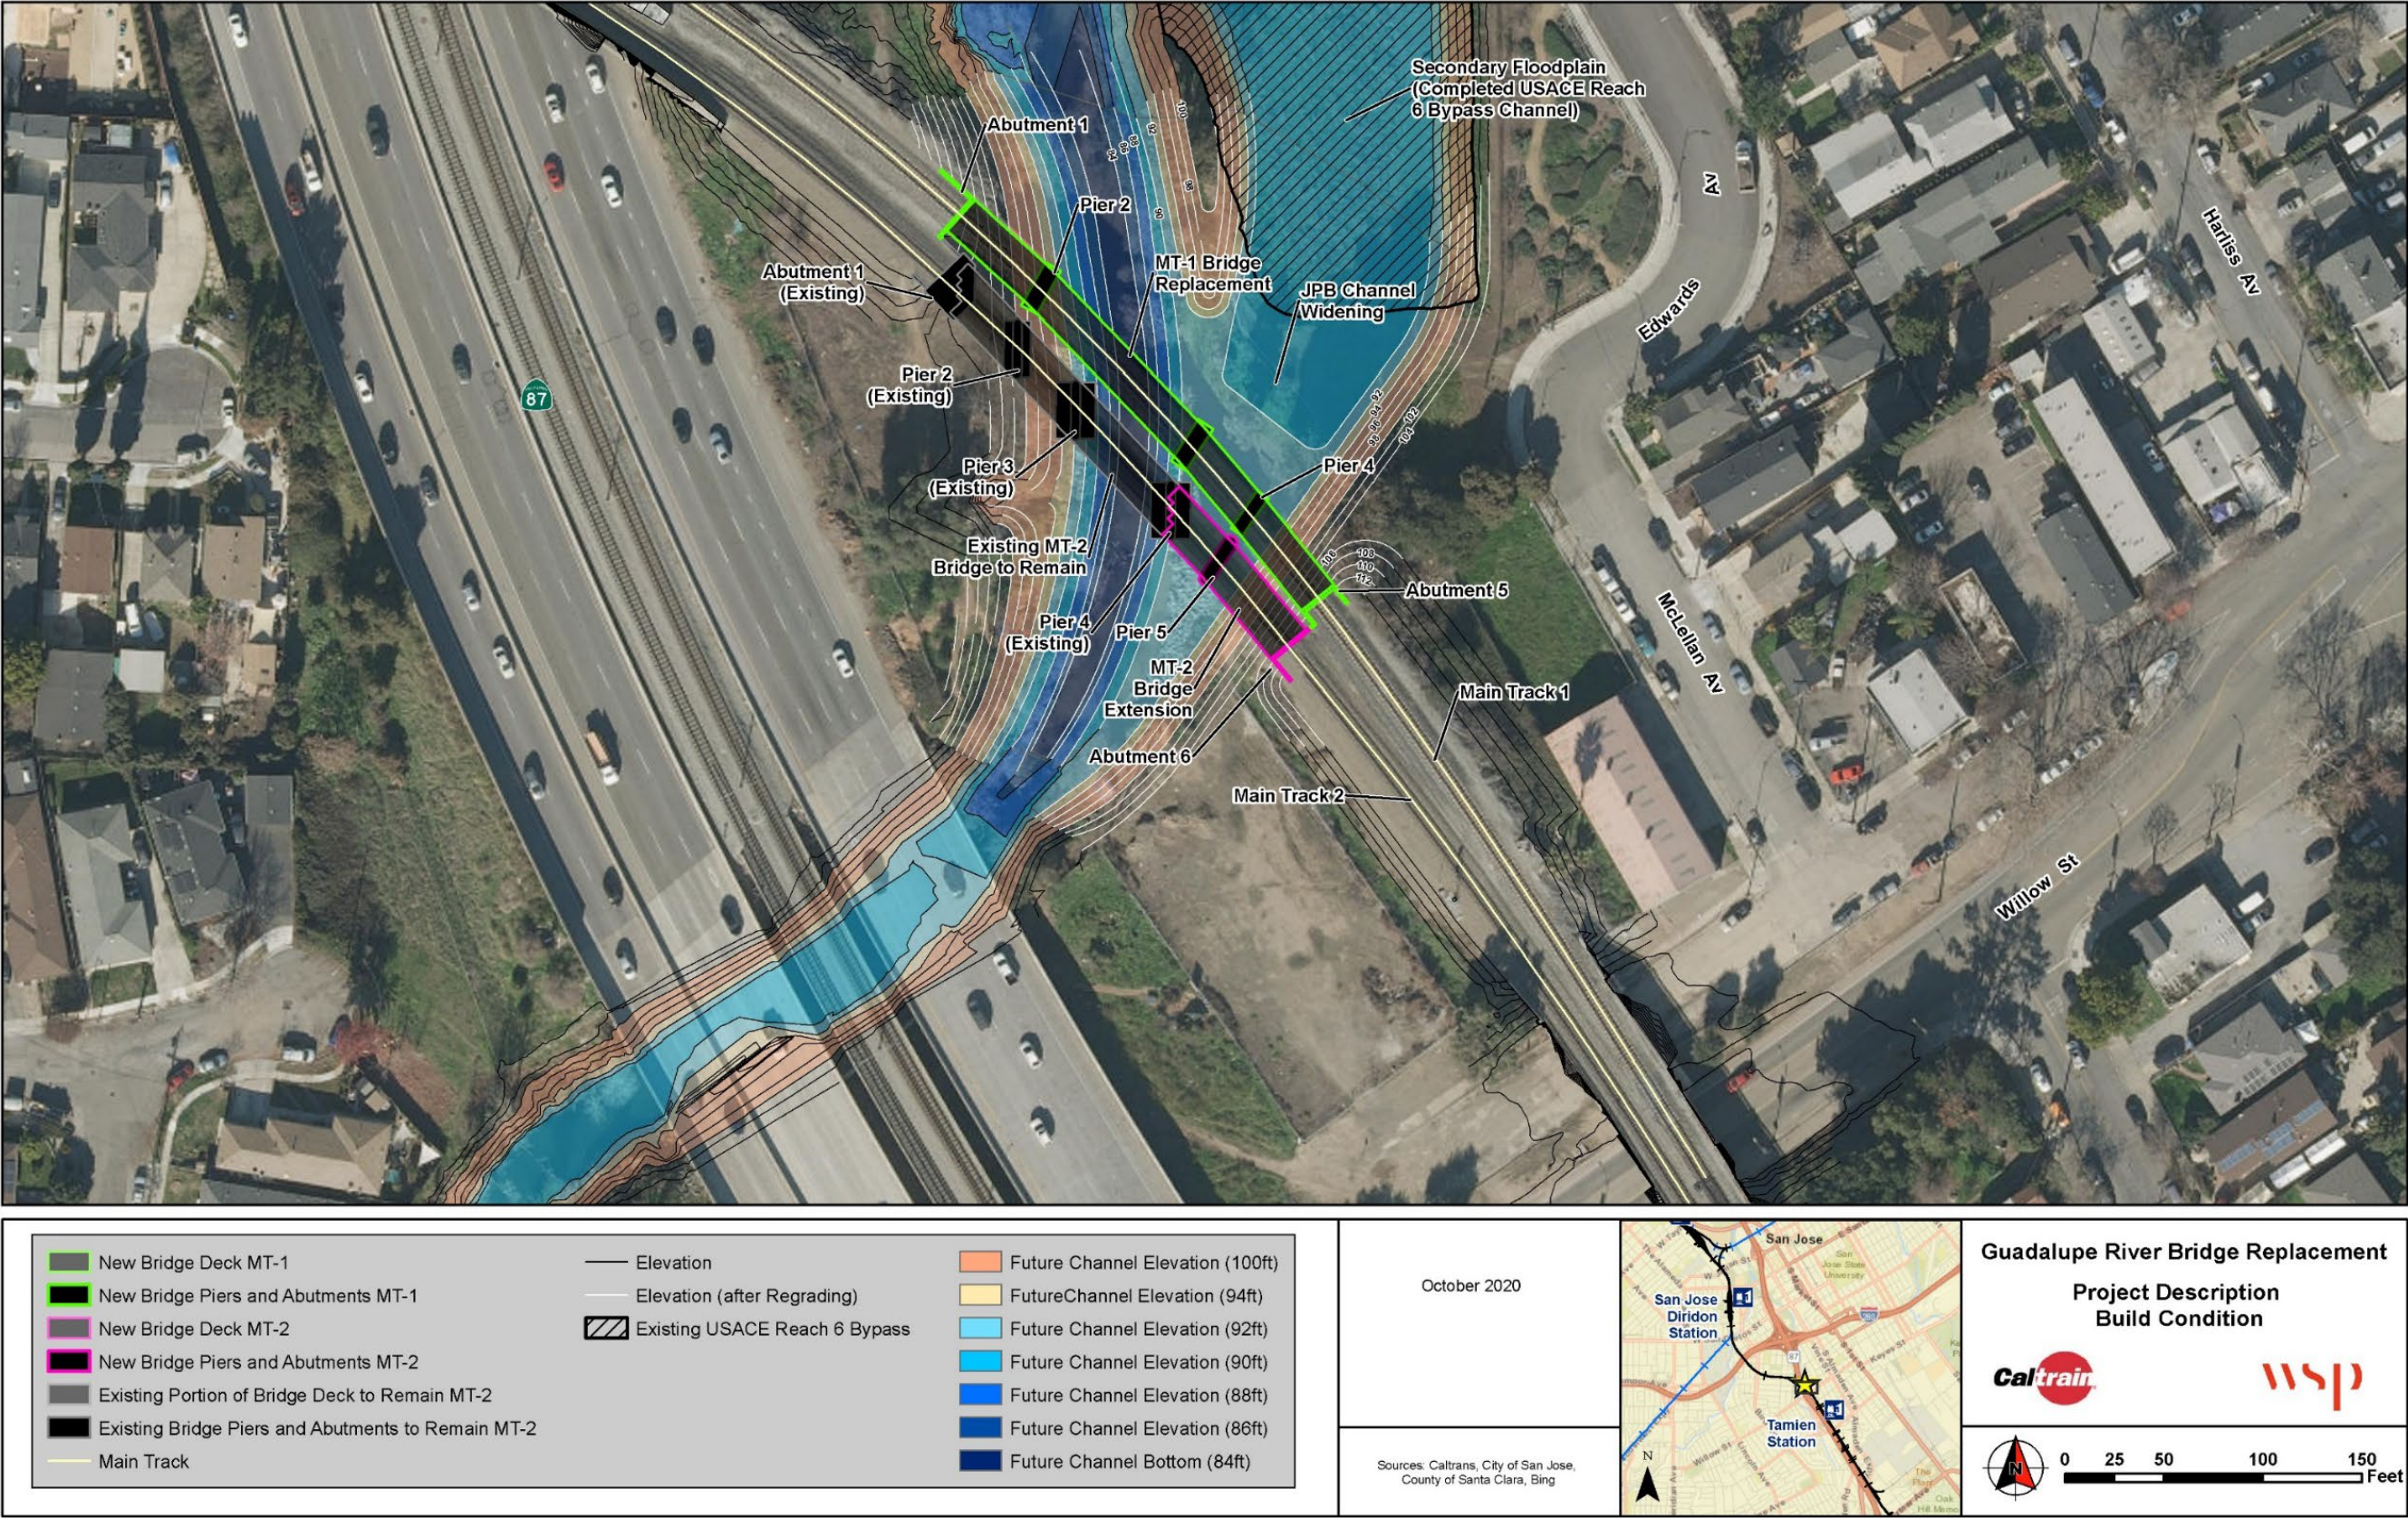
Guadalupe River Bridge Replacement Preliminary Design - Sheet 1 of 2
